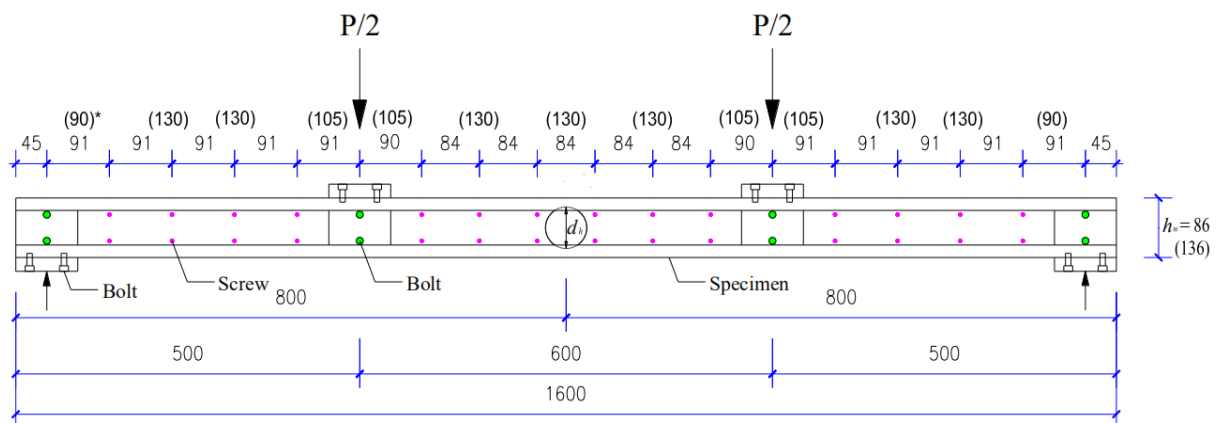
Loading rig for CFS built-up open section beams by [Wang and Young \(2015\)](#)
